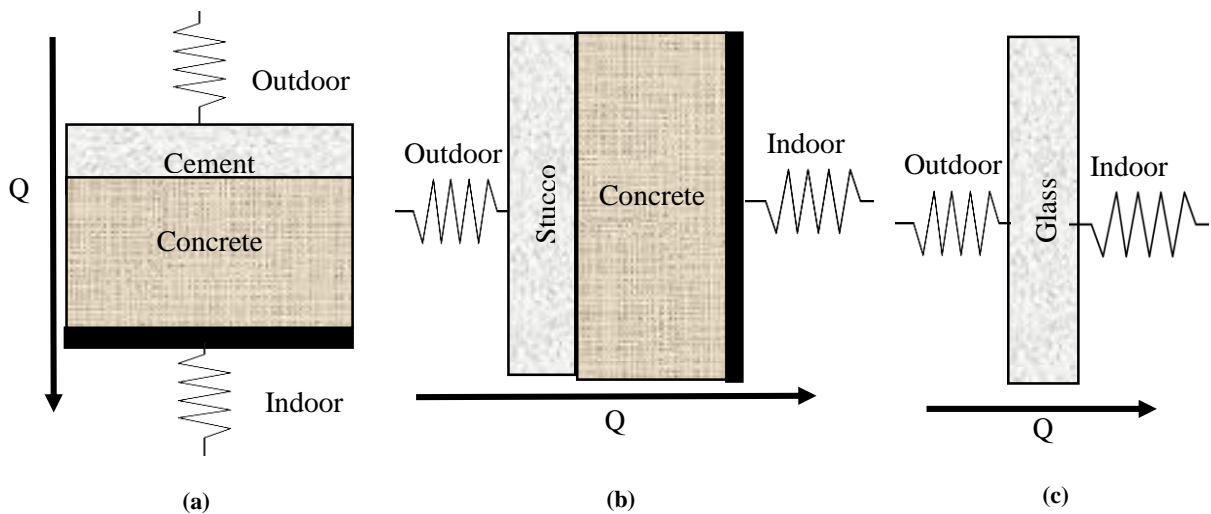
a. Roof Section, b. Walls Section, C. Windows Section
